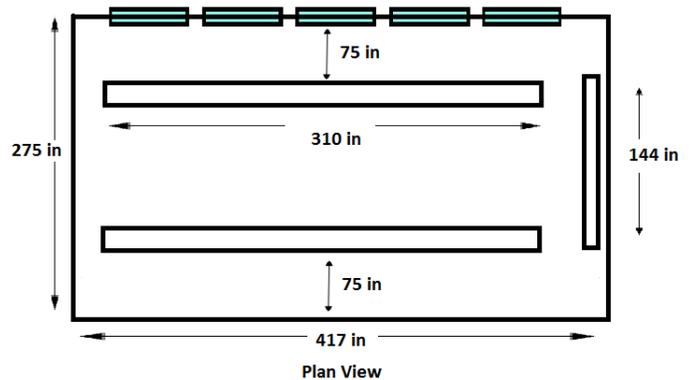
Shattuck Hall Room 211 luminaire placement. The long luminaires provide primary lighting for the room, while a short task light on the East wall provides illumination for the white board.
